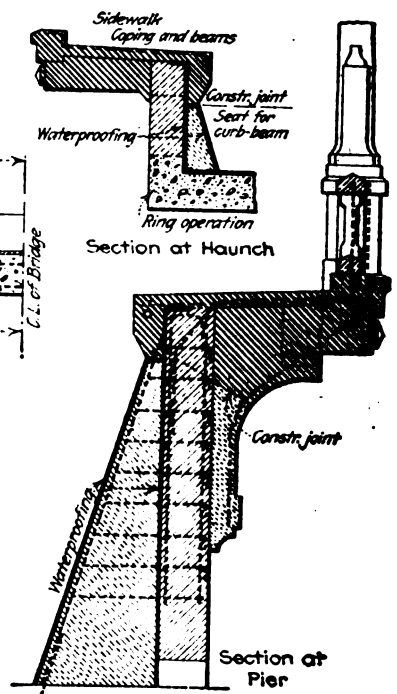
SPANDREL, SIDEWALK AND PARAPET DETAIL
